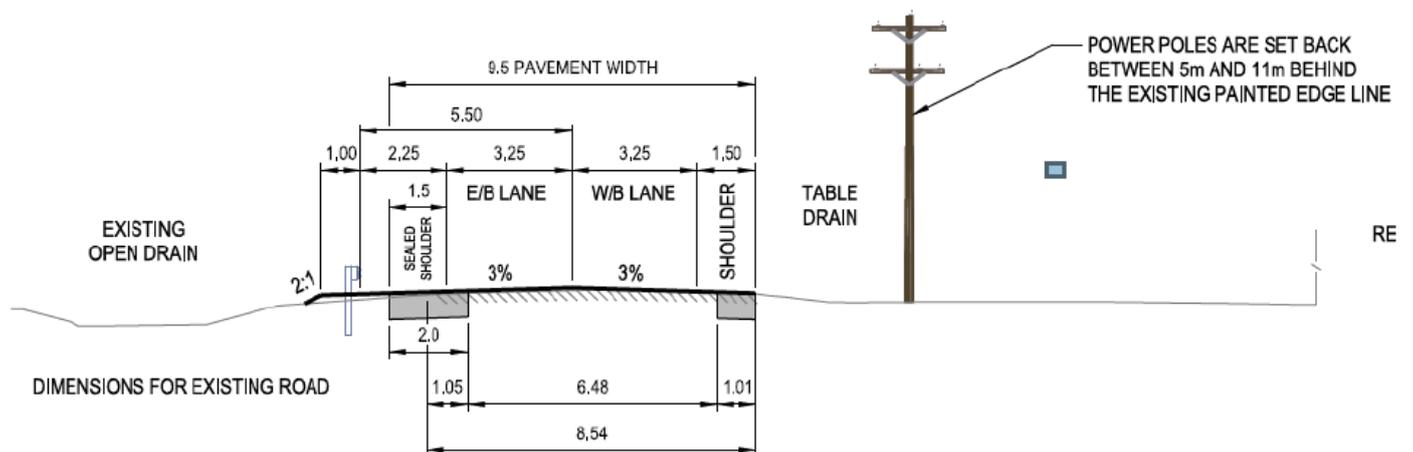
Proposed cross section for The Driftway Bridge west of the realigned section
